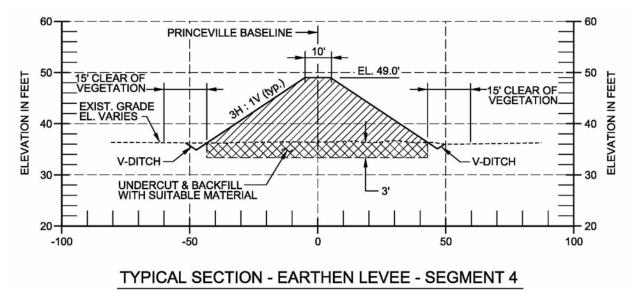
Typical Earthen Levee Section for Recommended Plan – Segment 4
